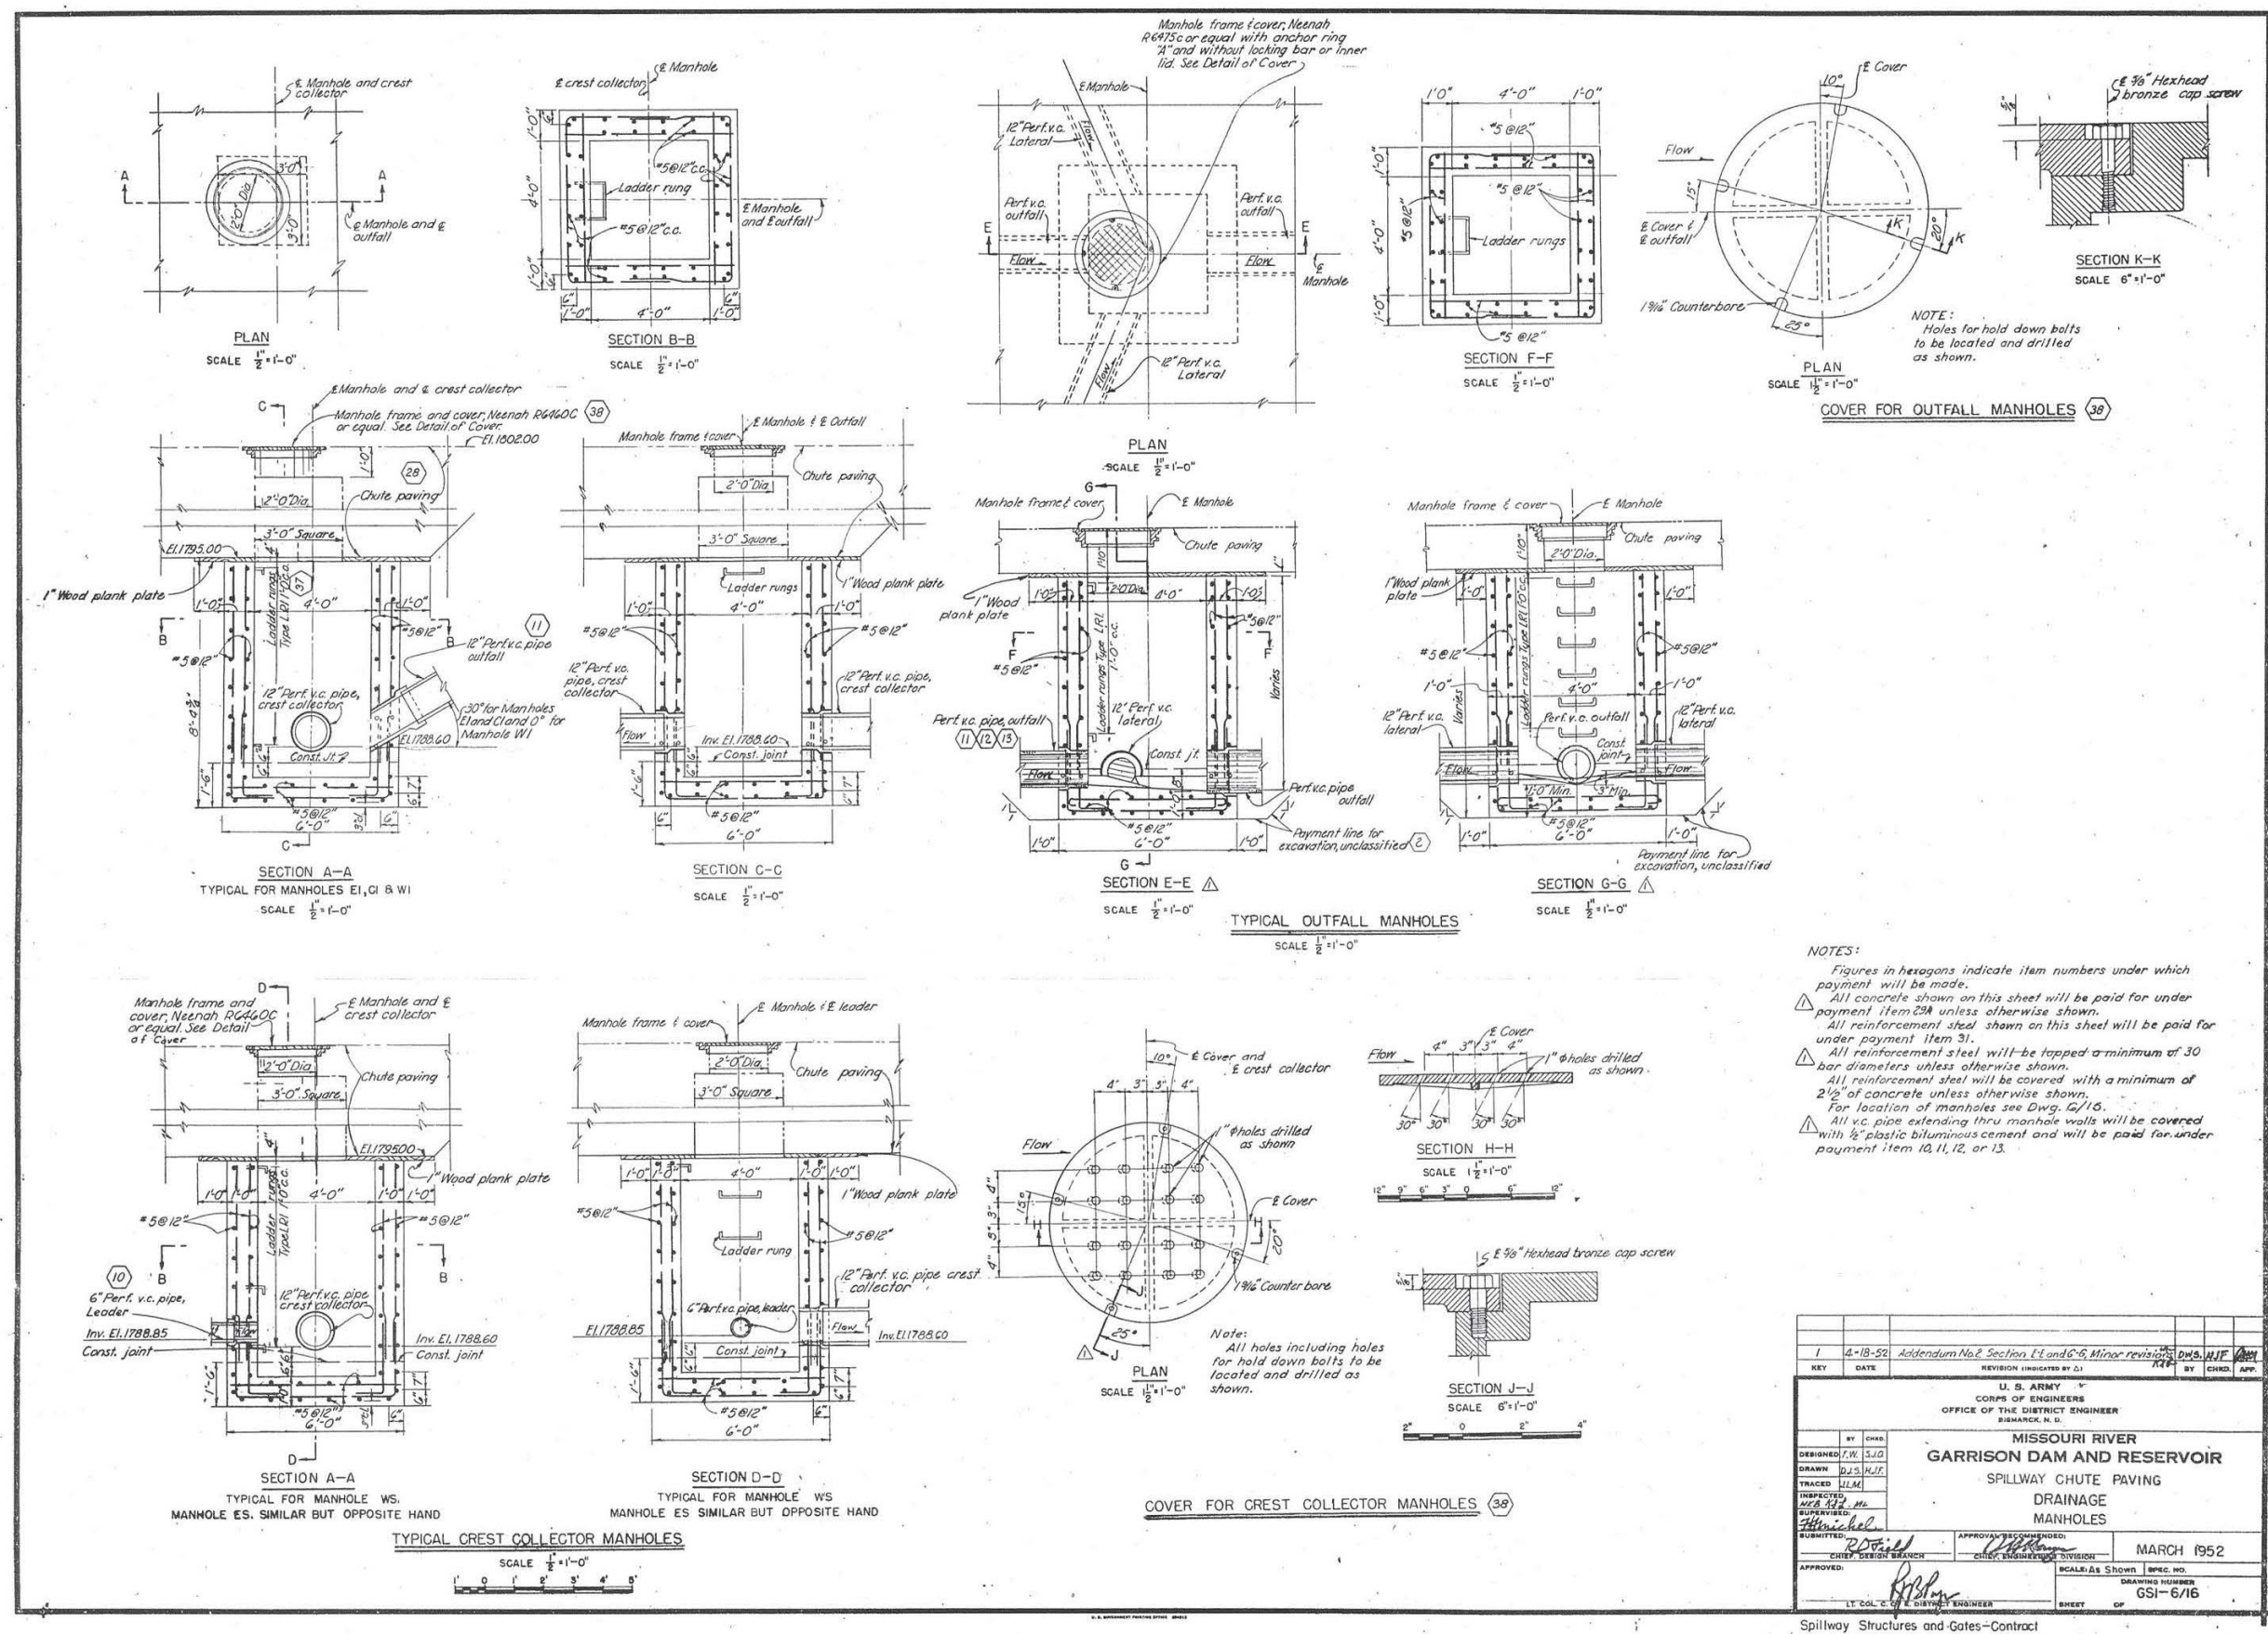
Spillway slab manhole details original drawing (GSI, upper chute)
